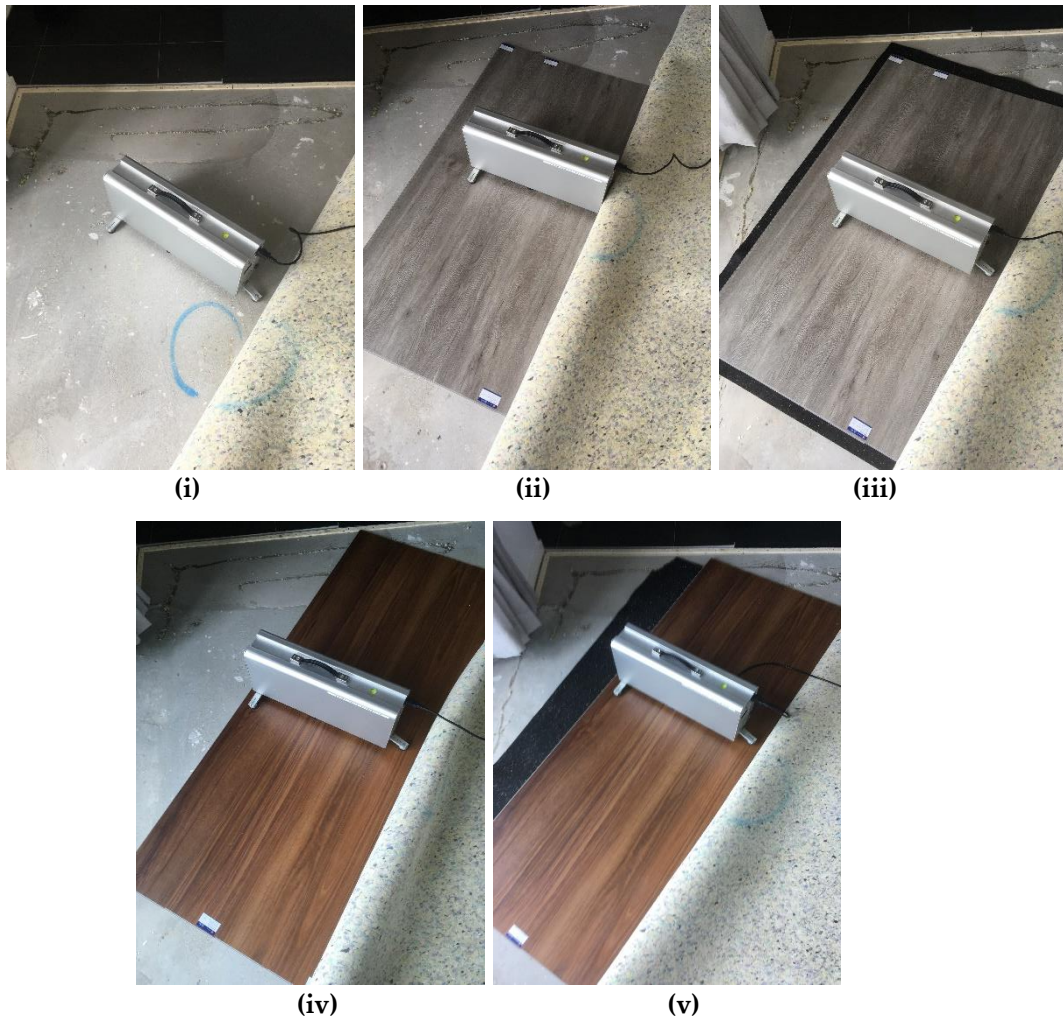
(i) Test 1, (ii) Test 2, (iii) Test 3, (iv) Test 4, and (v) Test 5
